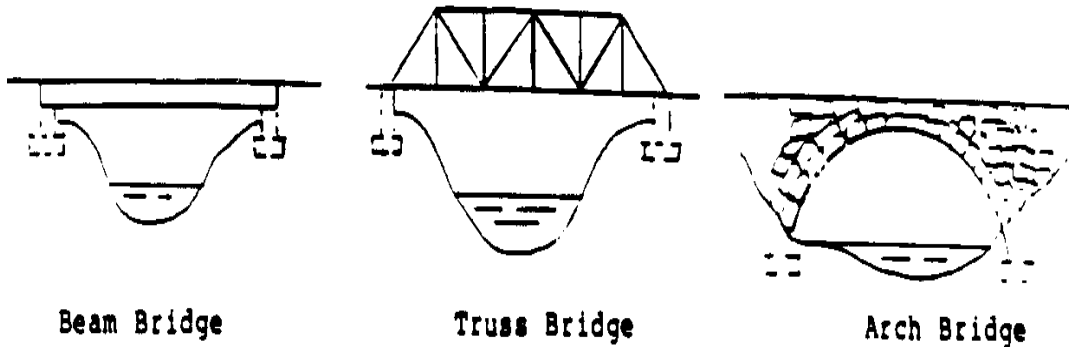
Three Types of Bridges: Beam, Truss, and Arch
